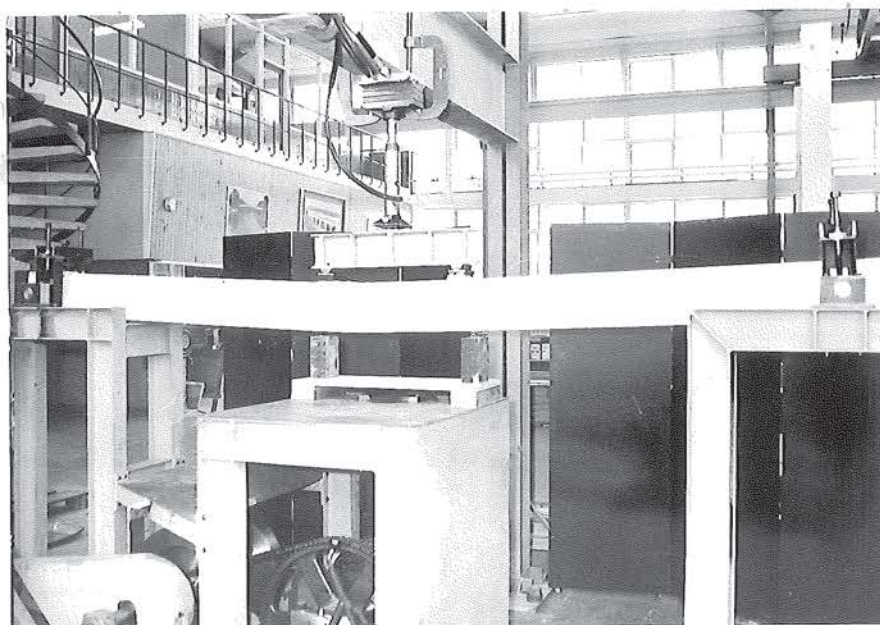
BEAM 3 after failure in the Static Test. The dial gauges for measuring the Deflection have been removed but otherwise the plate shows the conditions for the Static Test.
